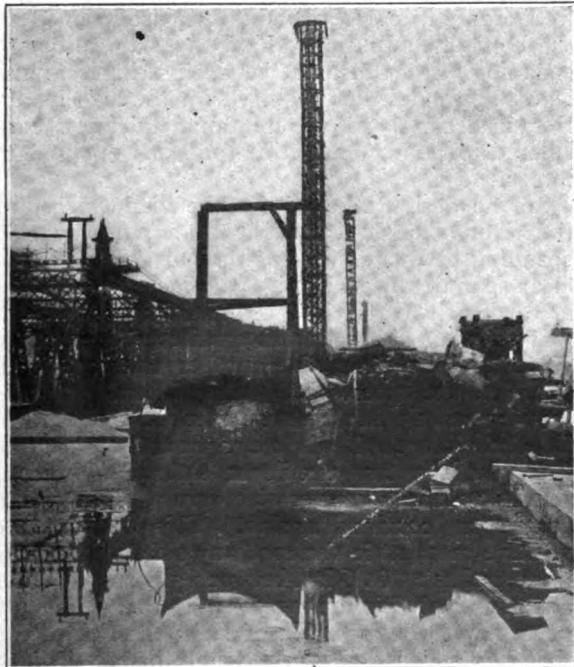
From These Three Towers All Concrete on Roosevelt Road Was Chuted to Place.
